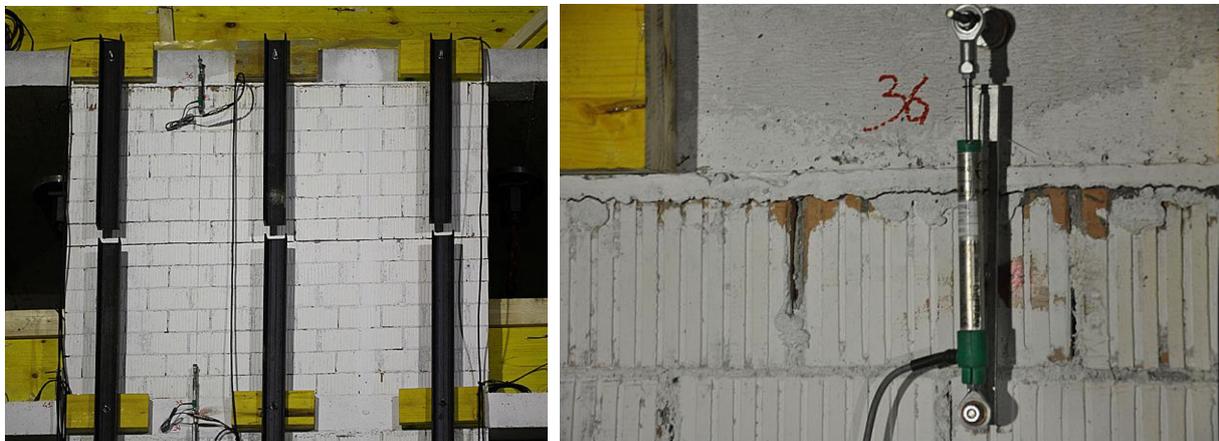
Observed damages in the out-of-plane loaded URM walls at the 4<sup>th</sup> storey on the North side of the structure: whole wall (left) and crack of the top mortar layer (right).
